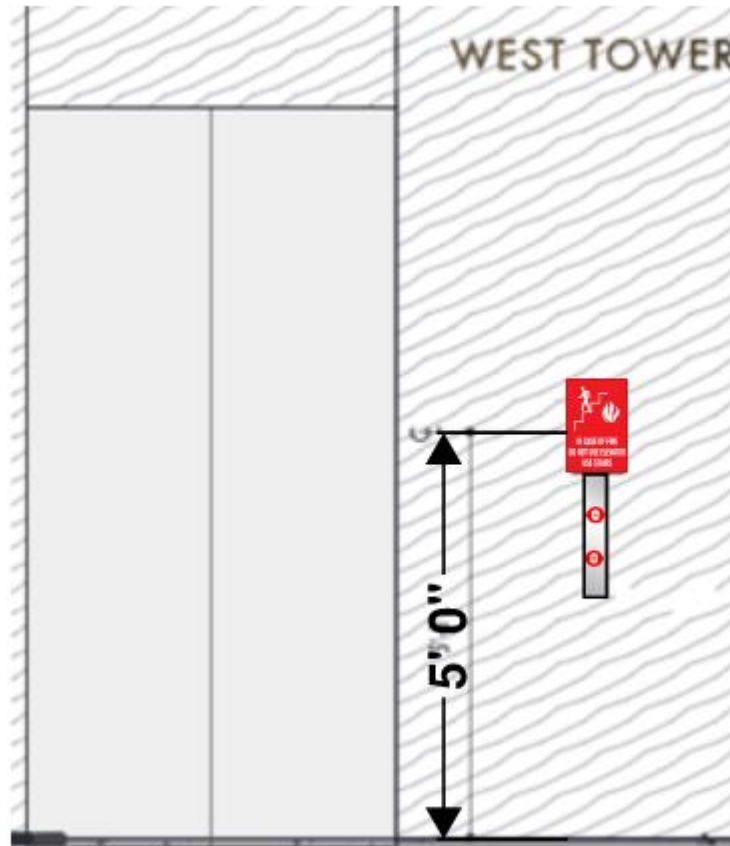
Example of Sign placed above the Elevator Controls 5 feet above the ground
